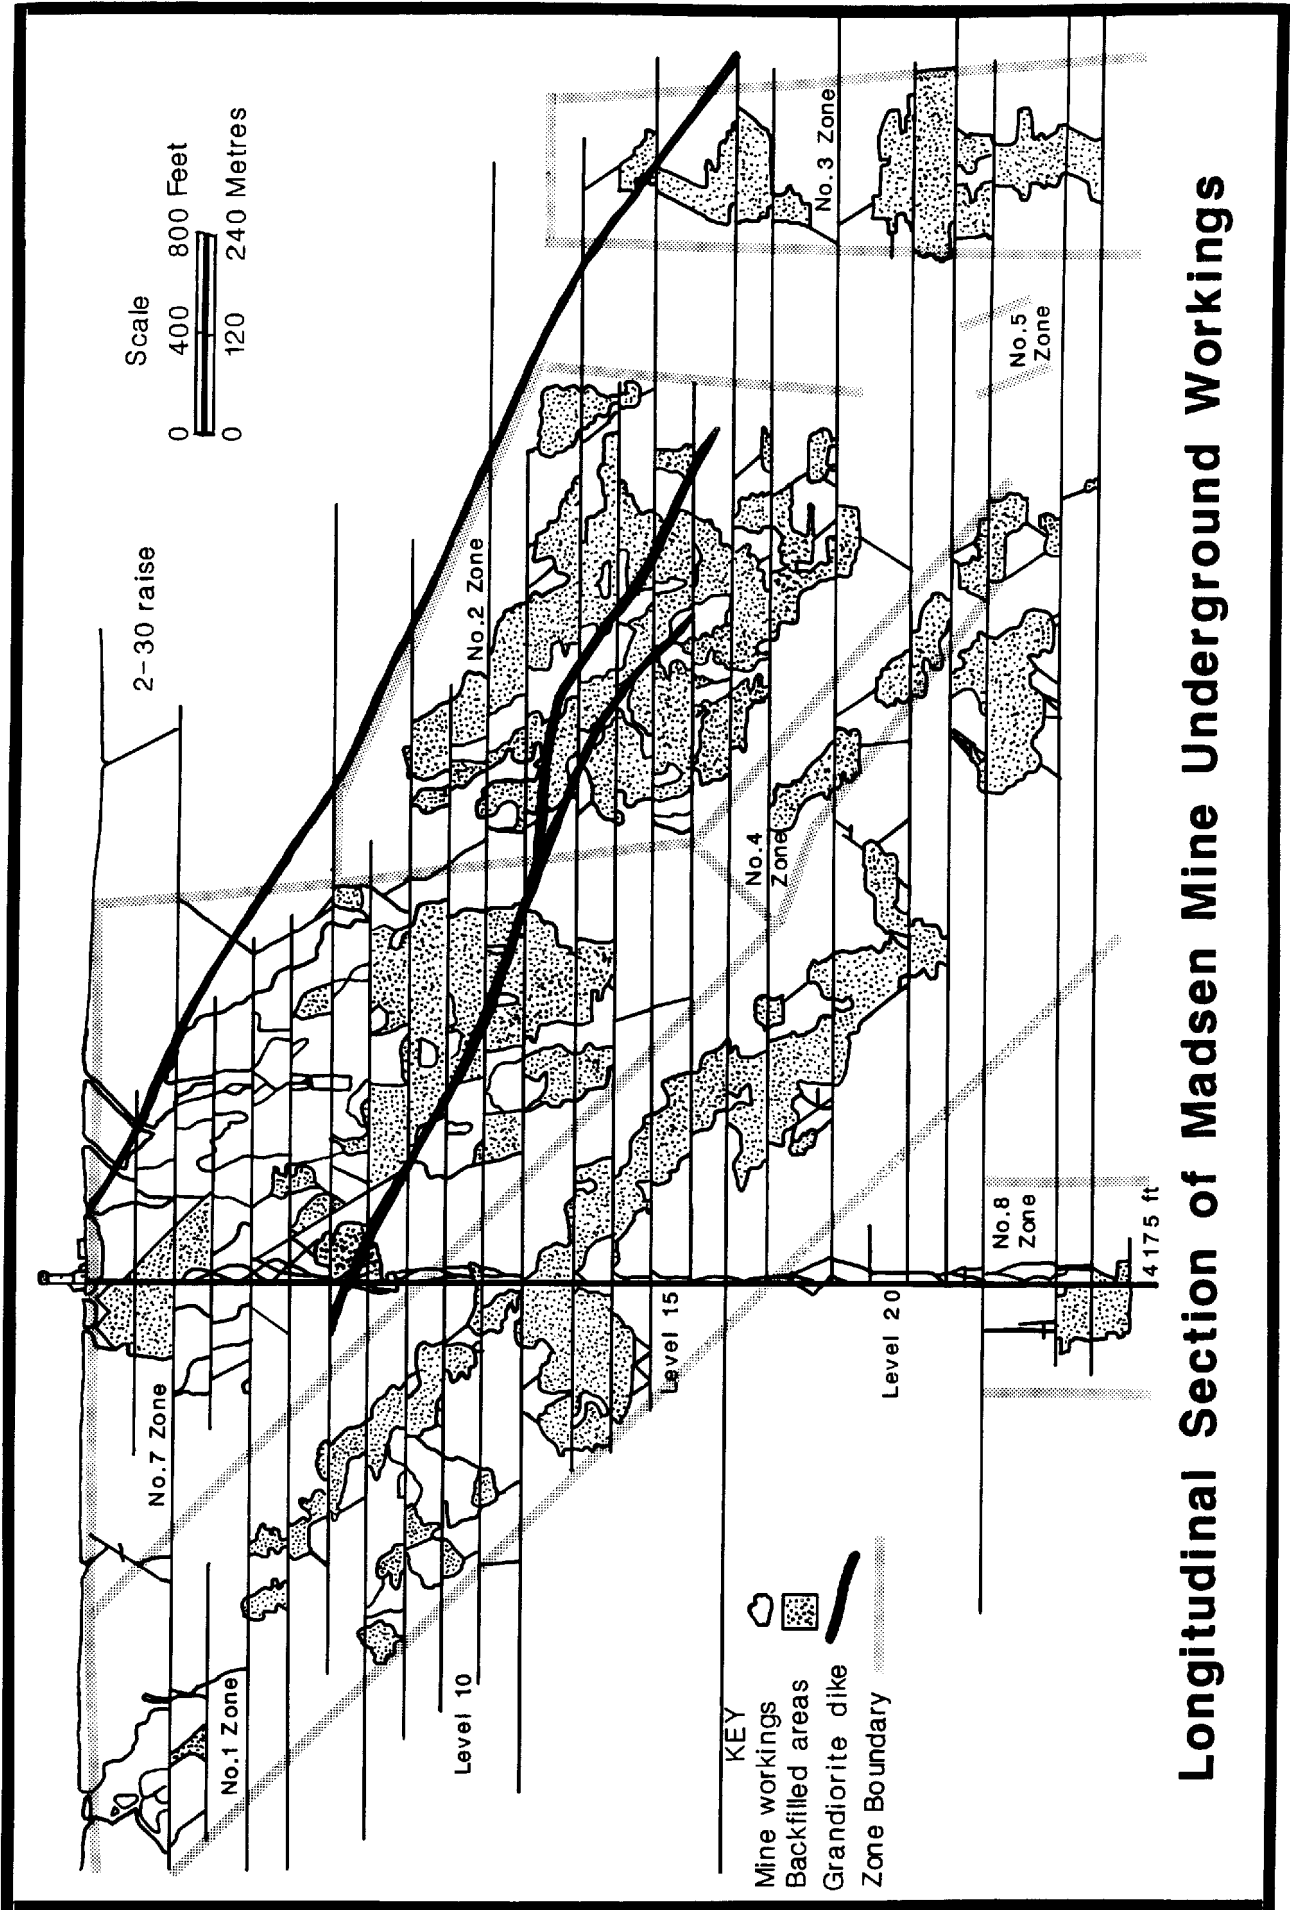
Longitudinal section of the Madsen Mine underground workings, Baird Township.
